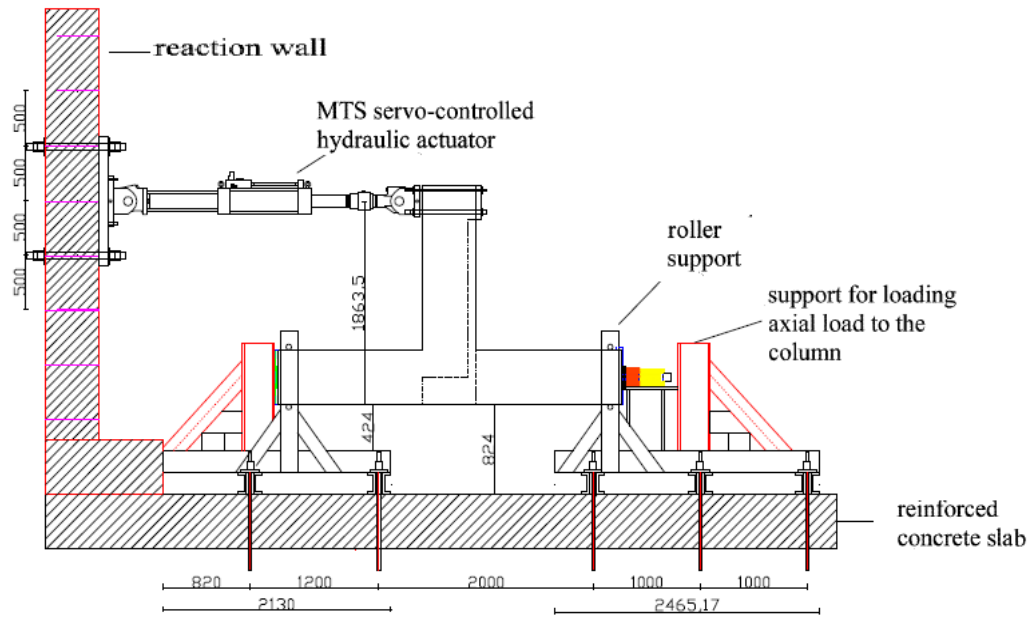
Horizontal Frame for Test Specimens [19, 20]
